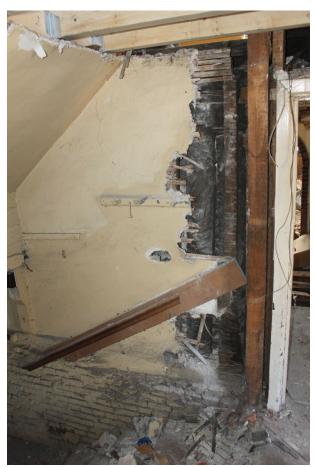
Timber and plaster behind chimney stack in Structure A. Photograph taken facing west.
